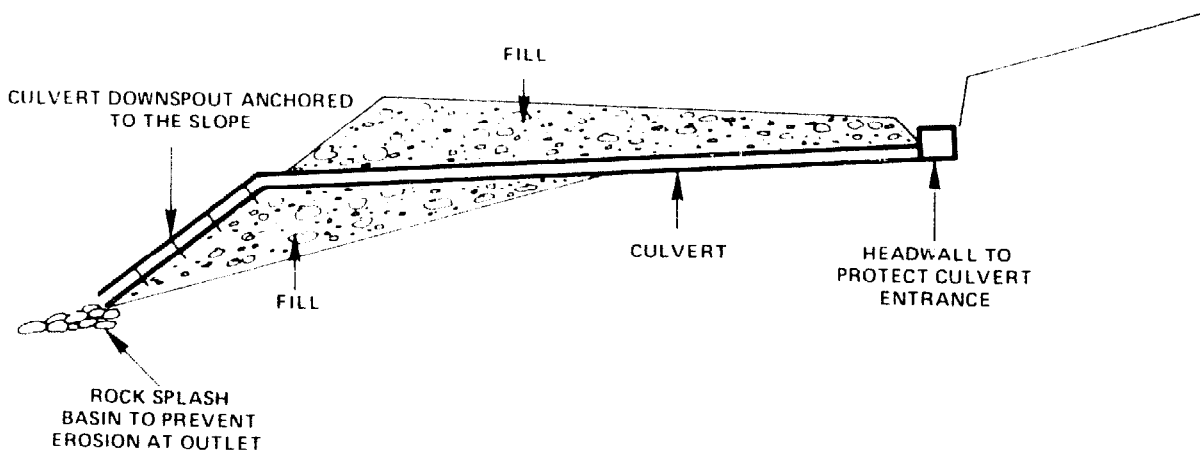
Culvert installation illustrating the use of a headwall, downspout, and a splash basin at the downstream end.
